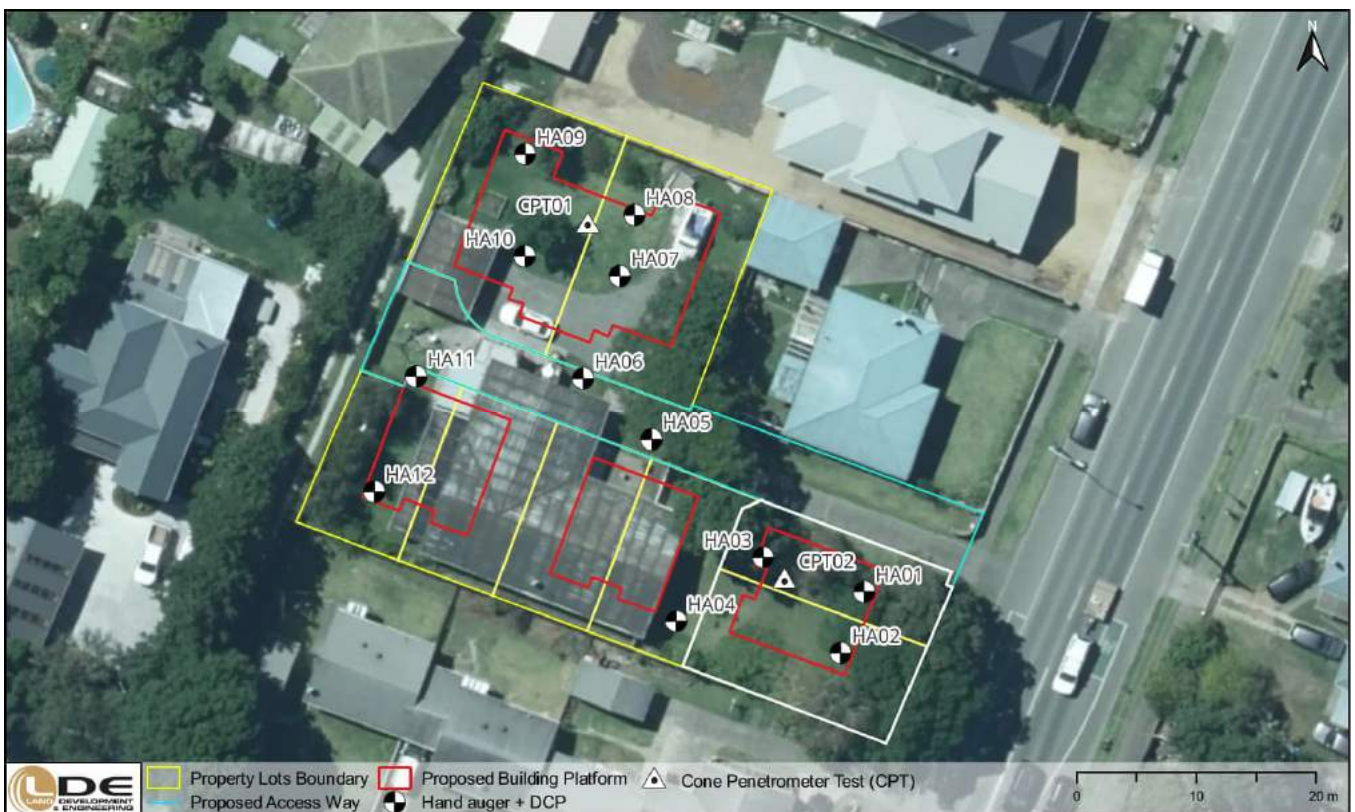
Geotechnical Investigation Plan for proposed development, Lot 1 and 2 highlighted in white.
